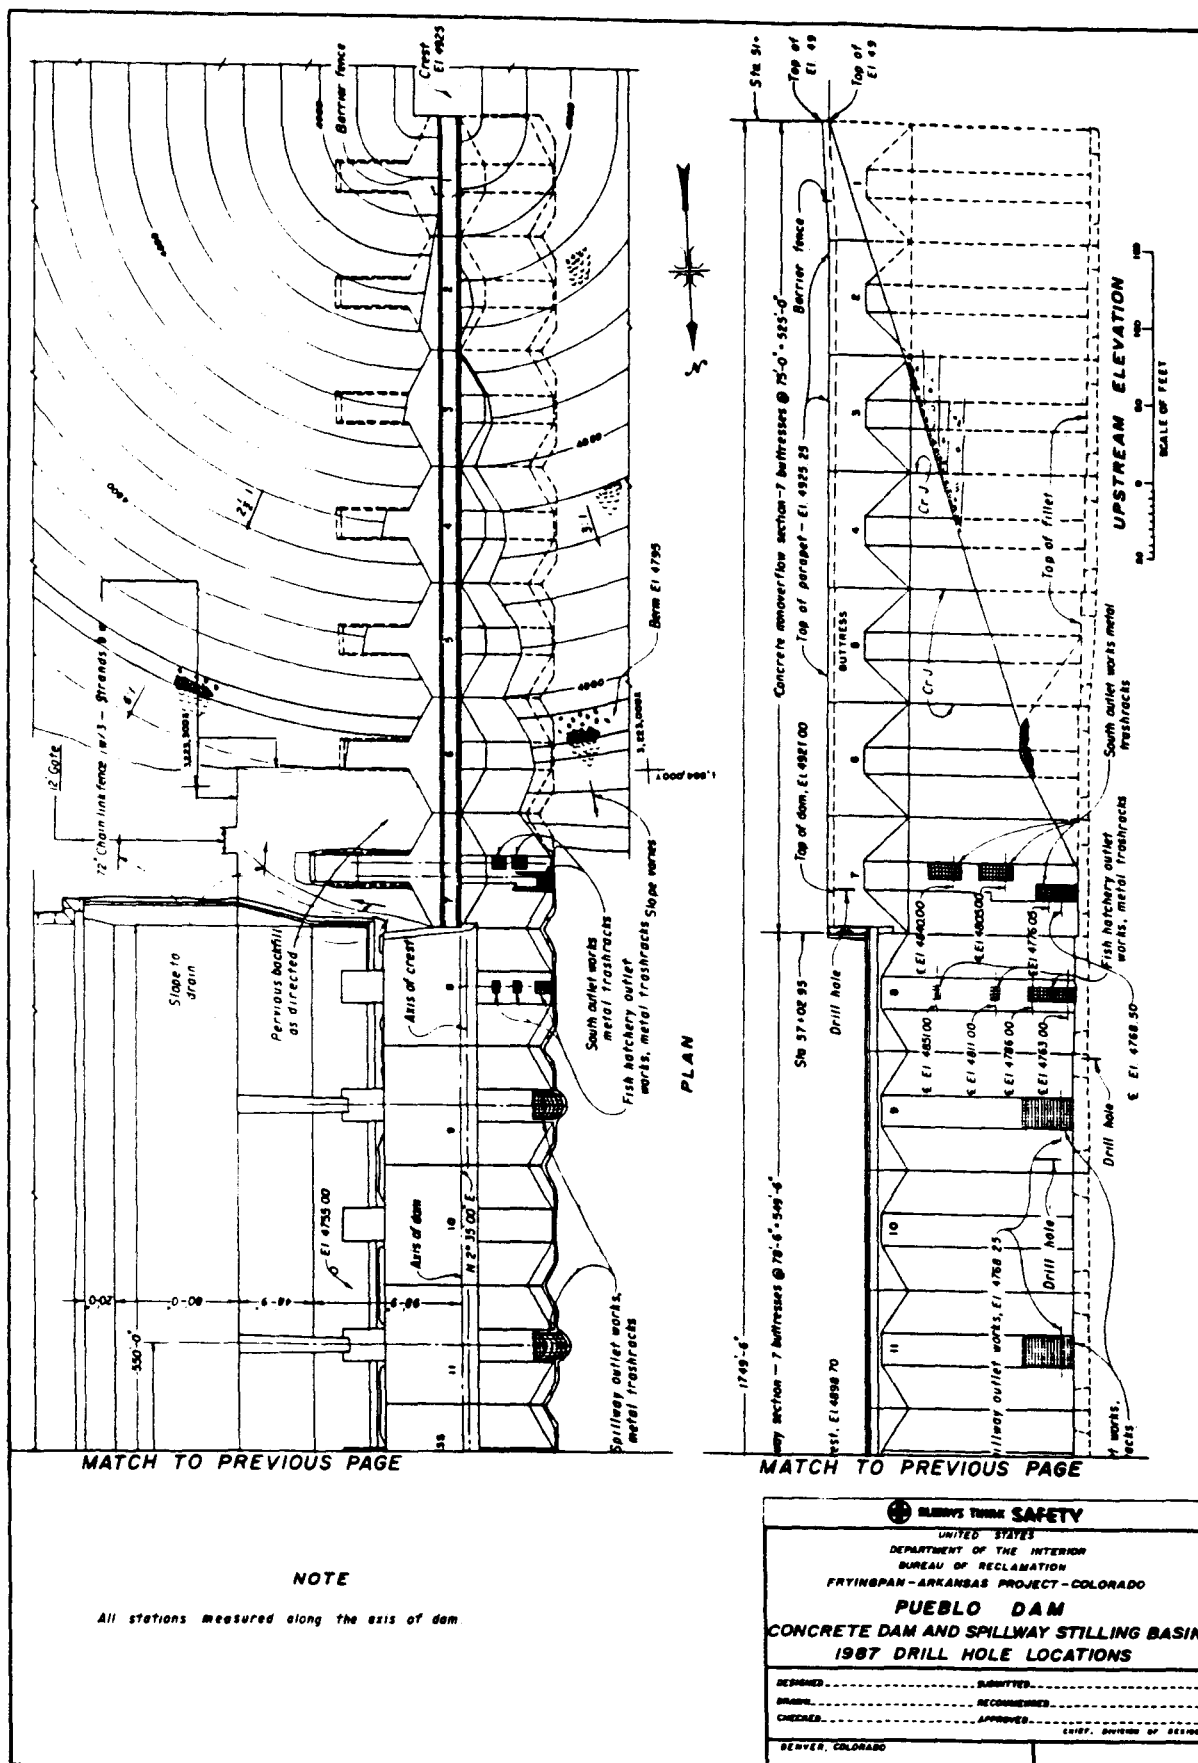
Pueblo Dam - concrete dam spillway stilling basin plan and elevation, right side - 1987 drill hole locations.
